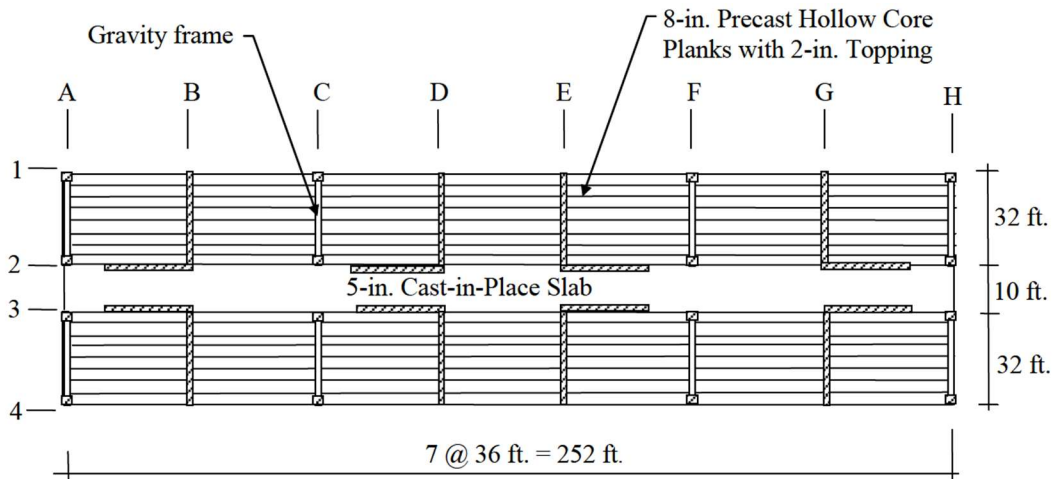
Typical plan layout for an N695 archetype (4-story design shown). Note that the number of walls varies for different building heights (NIST, 2010).
